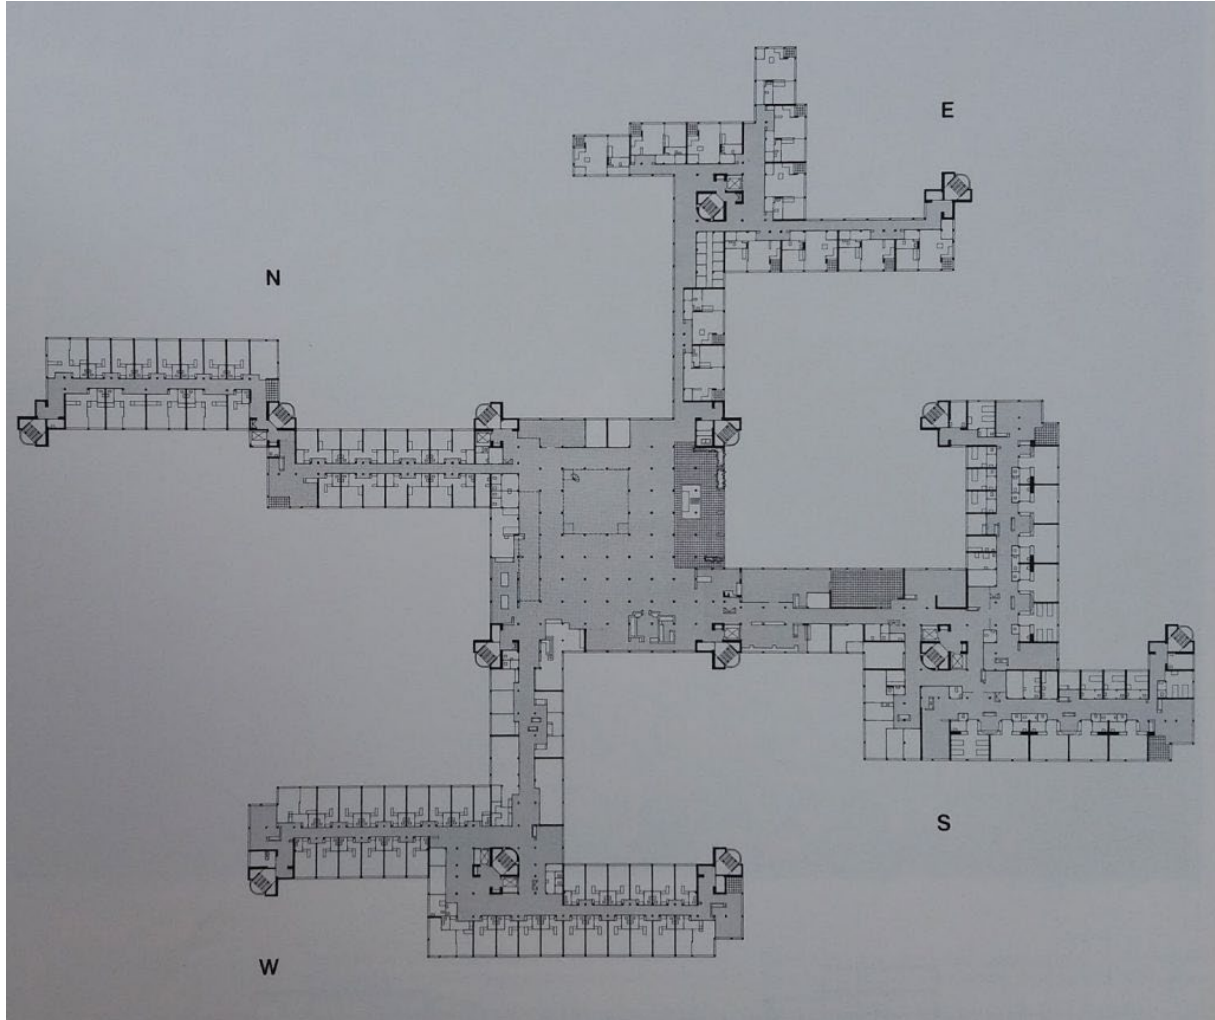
Floorplan ground floor *De Drie Hoven*, (*Hidden Architecture*, n.d.)
